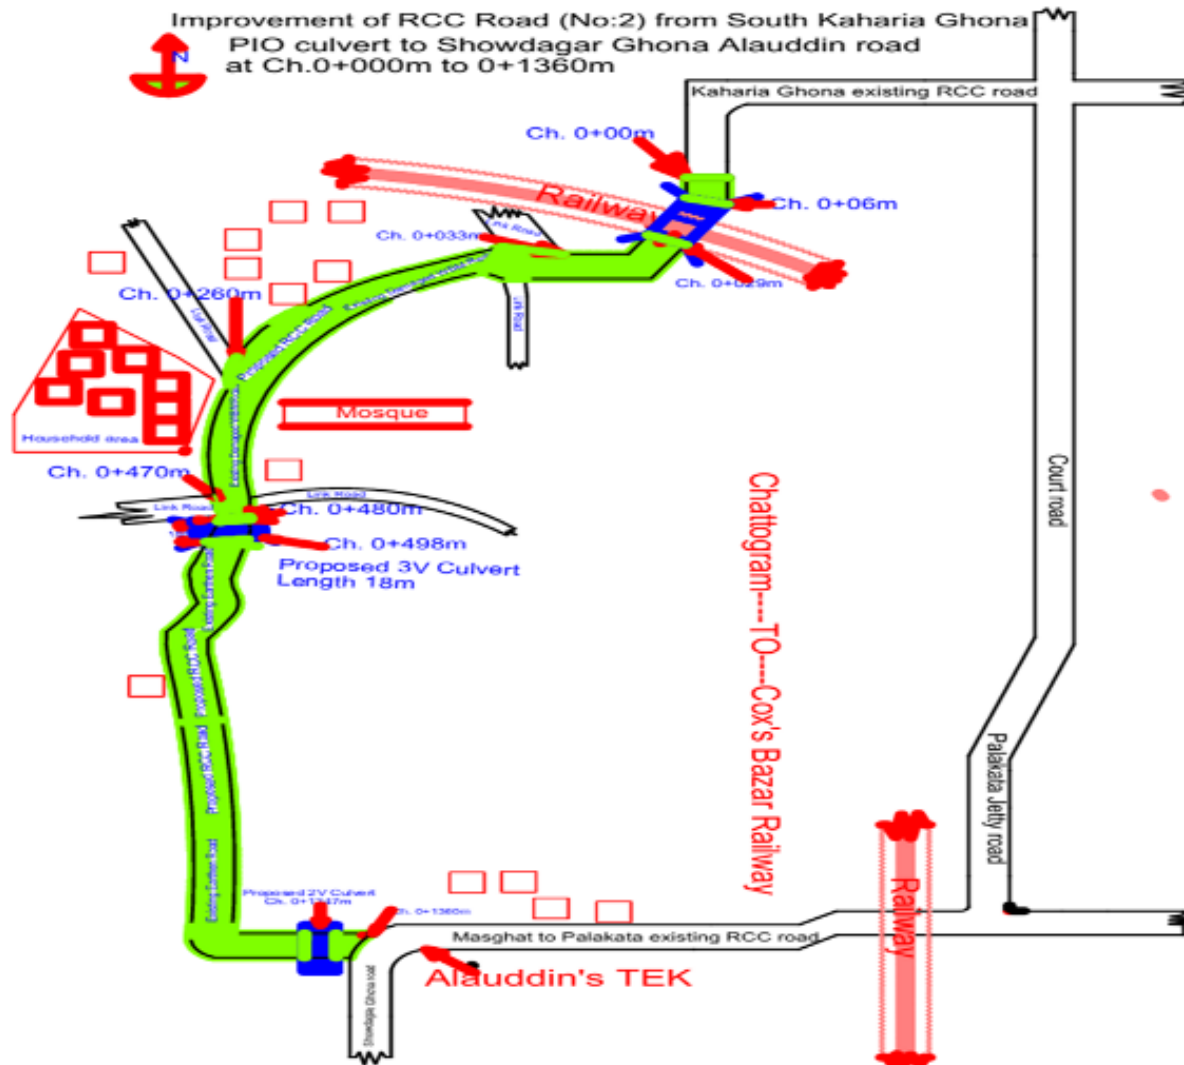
Zone Layout Plan of the Proposed Subproject Area (Road) and its Adjoining Roads with Influence Zone
